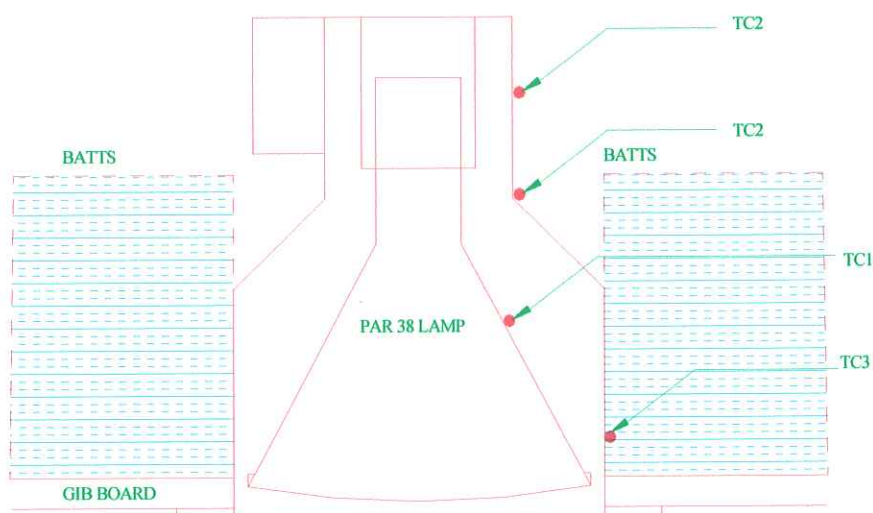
Diagram of Loretto Fitting Installation and Thermocouple, TC1, 2, 3, and 4 Positions
